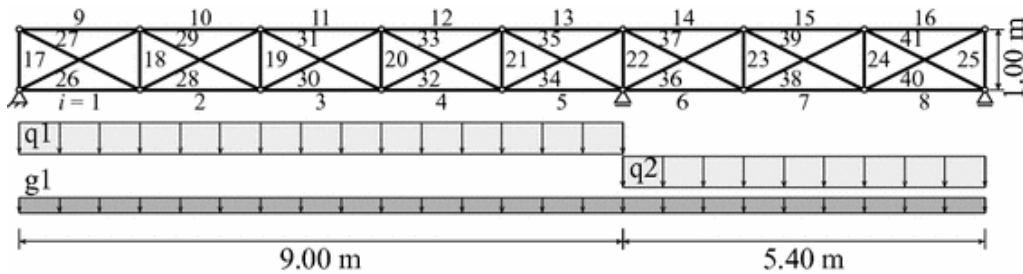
Bridge truss system – ground structure (Brütting et al. 2018, 18)
